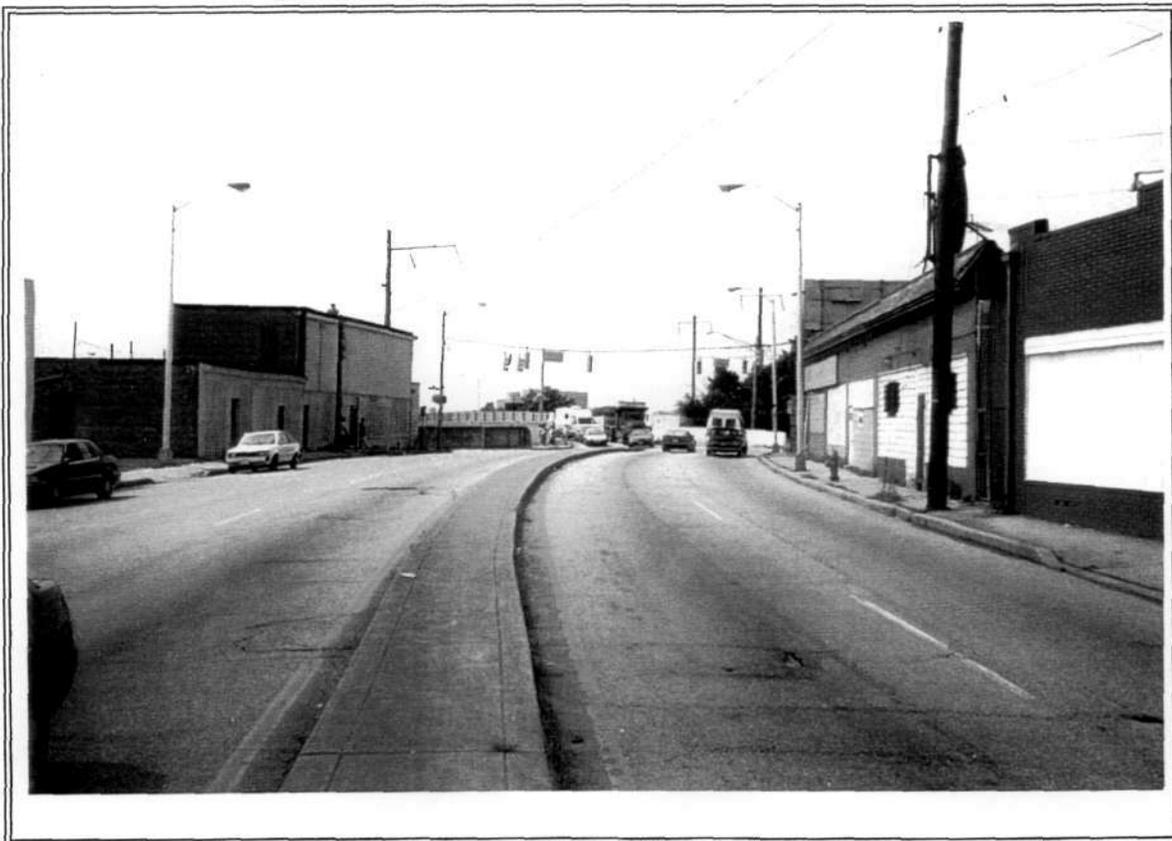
View toward the bridge from Hilton Street, looking southeast (#25)
